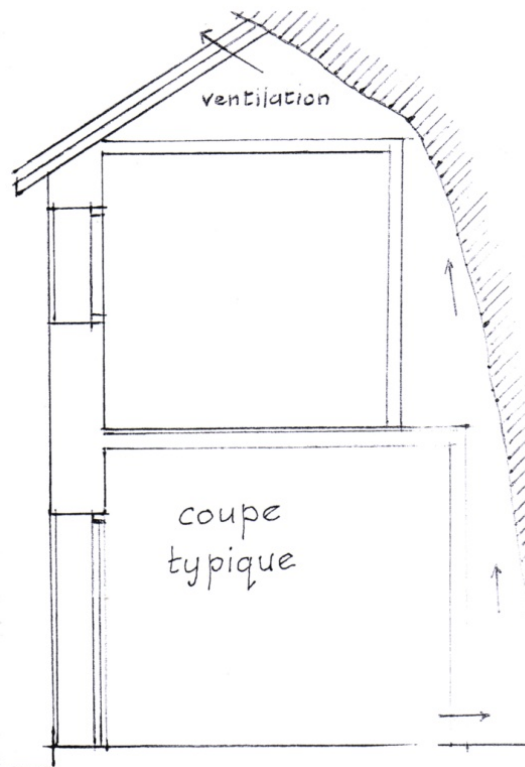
Les Giroutaux, Les Eyzies. Ventilation of structure built within a cave (photograph and drawing by the author).
